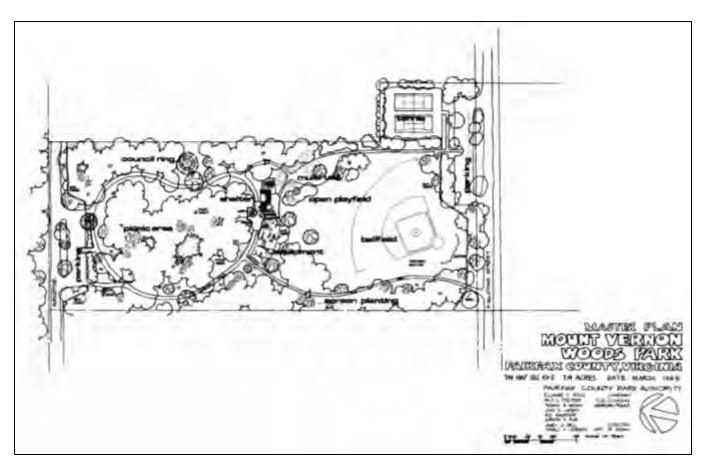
Mount Vernon Woods Park Master Plan approved in 1965
